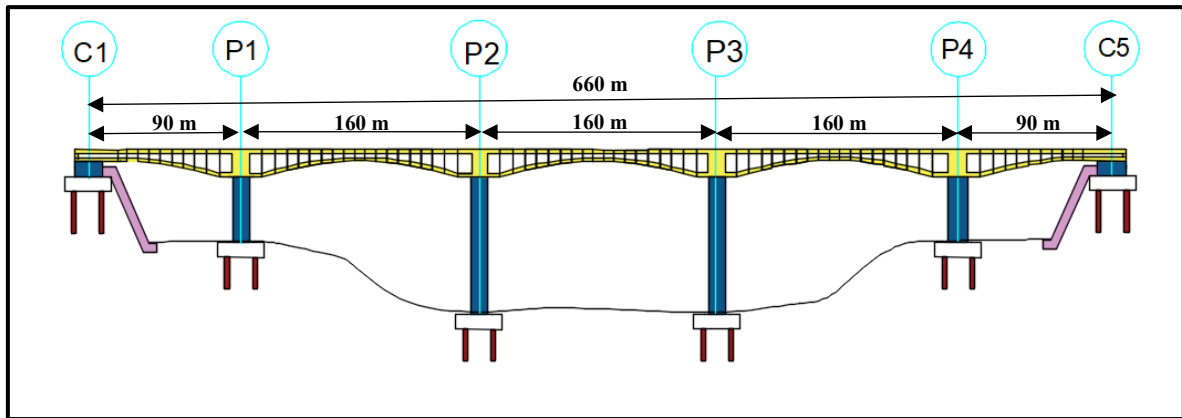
Longitudinal Elevation of the Five-Span Prestressed Concrete
